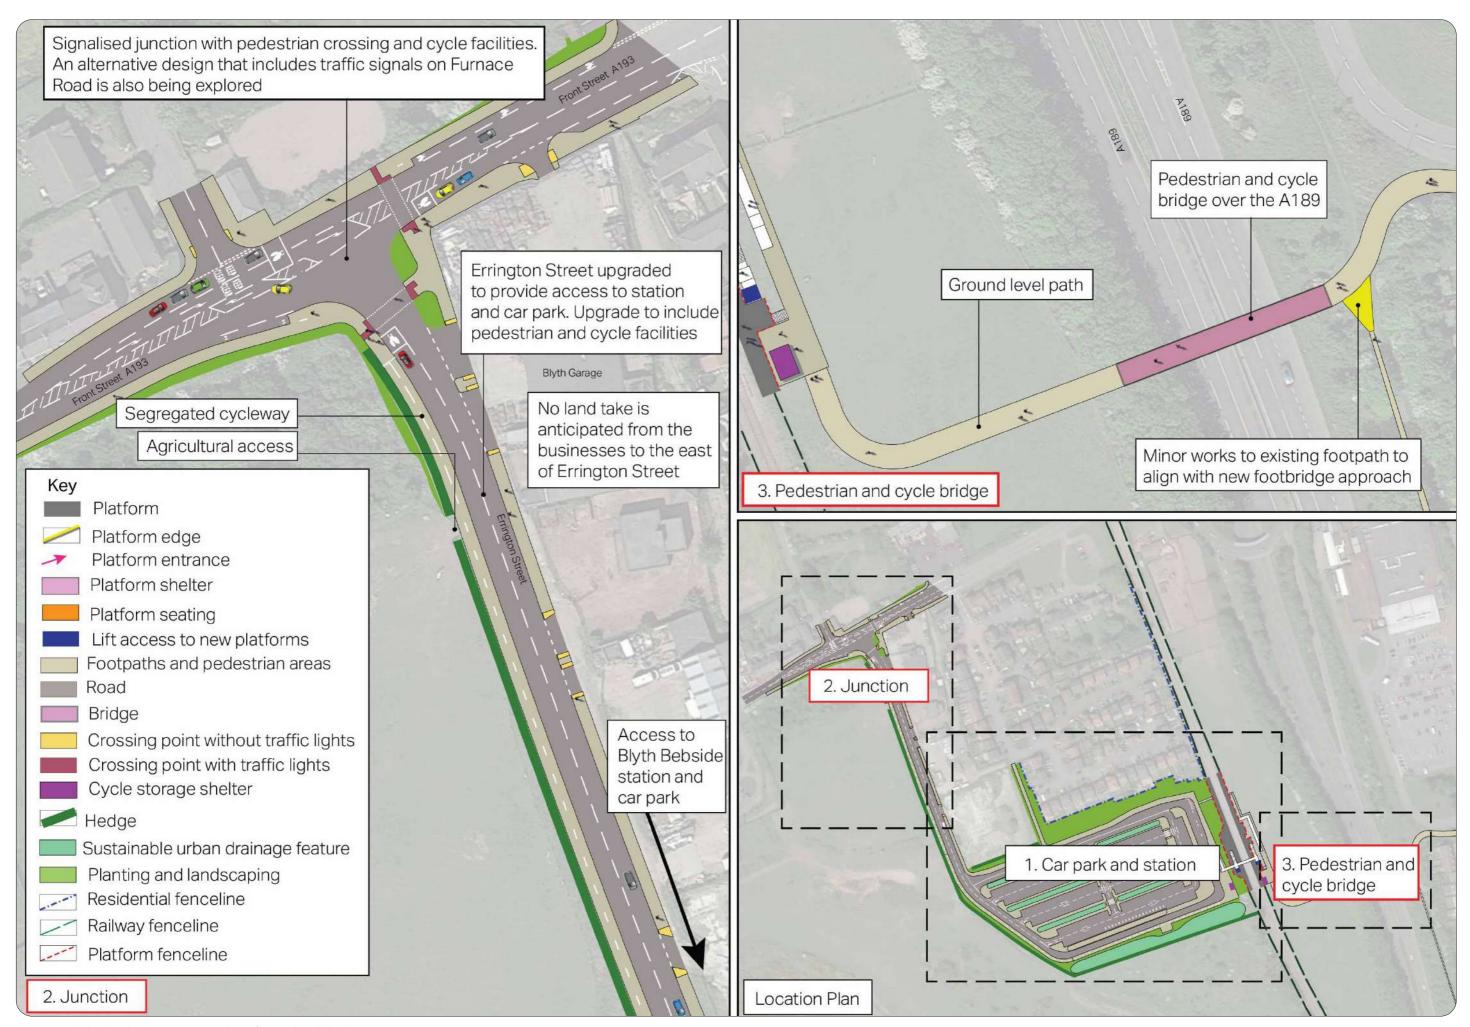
Blyth Bebside station access and new foot and cycle bridge
